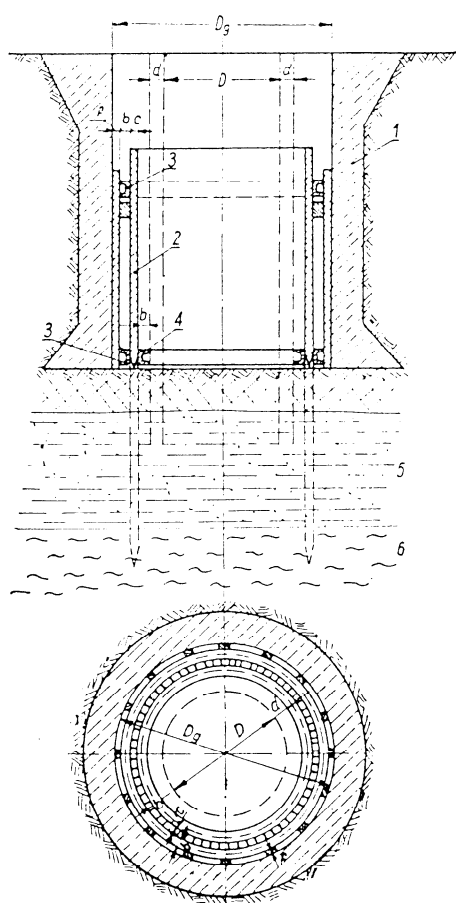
Sketch of vertical wooden pile wall for circular shaft.
